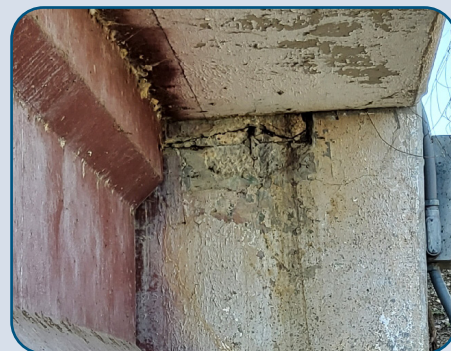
MCLB Backwall Cracking and Spalling.
